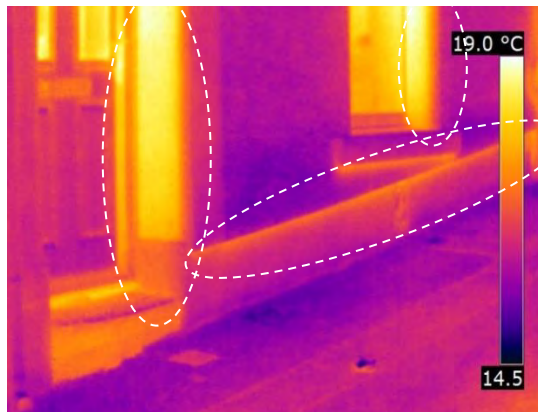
Thermogram of bottom of door and ground floor window and wall to pavement junction for Case study A after installation of EWI
